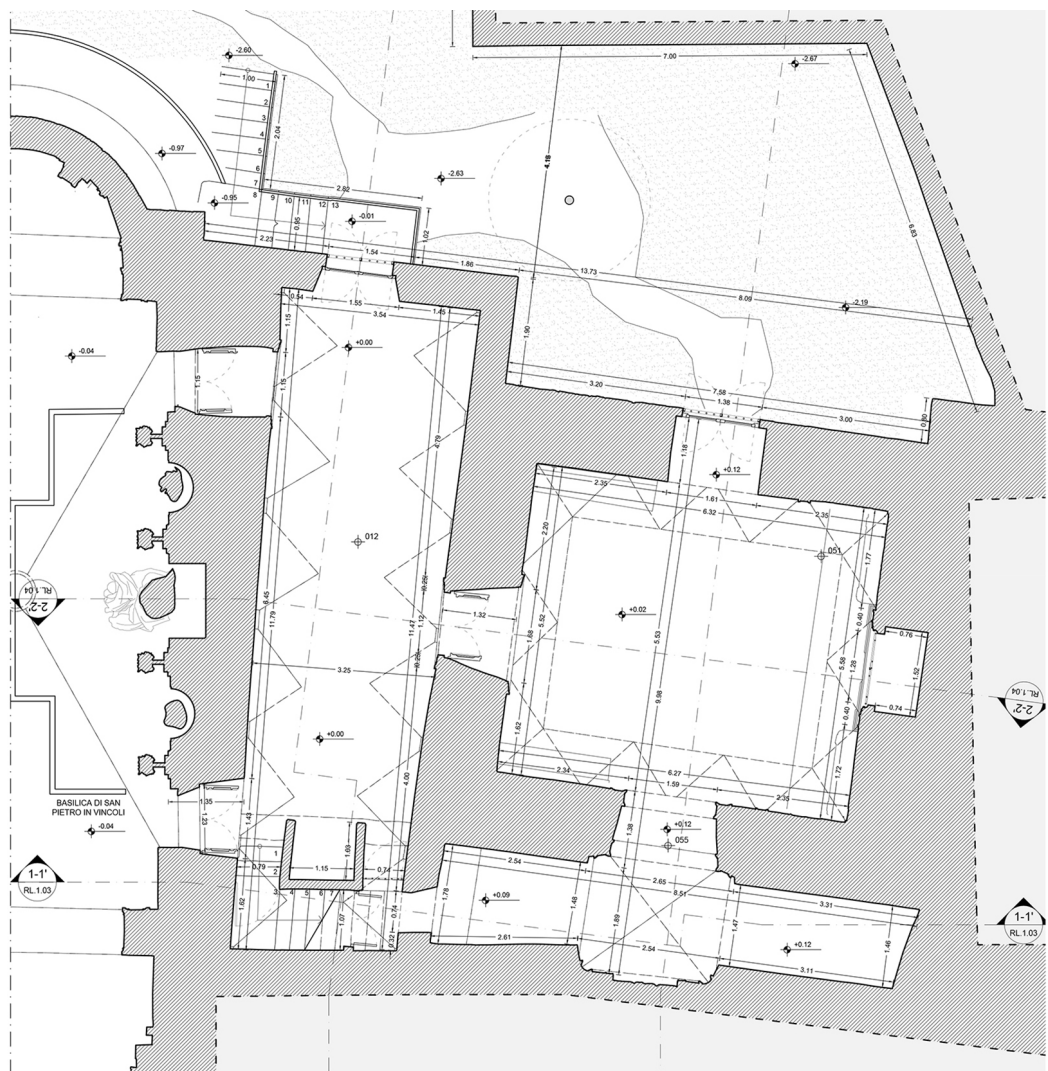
Planimetric rendering from a point cloud, requested at the detail scale of 1:50 (Author's elaboration).
